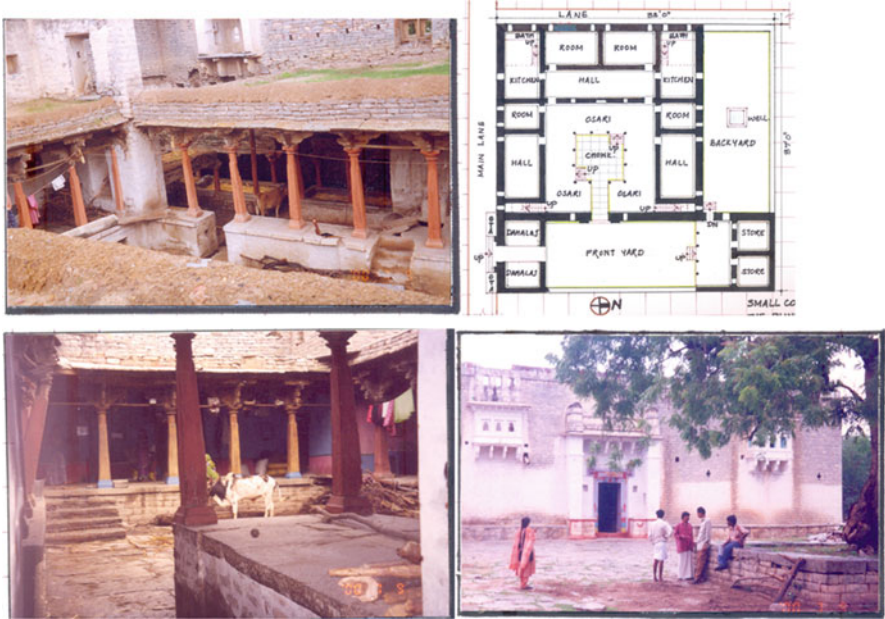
Planning features of a vernacular house: cowshed, plan of the house, rooms around courtyard, and main entrance
